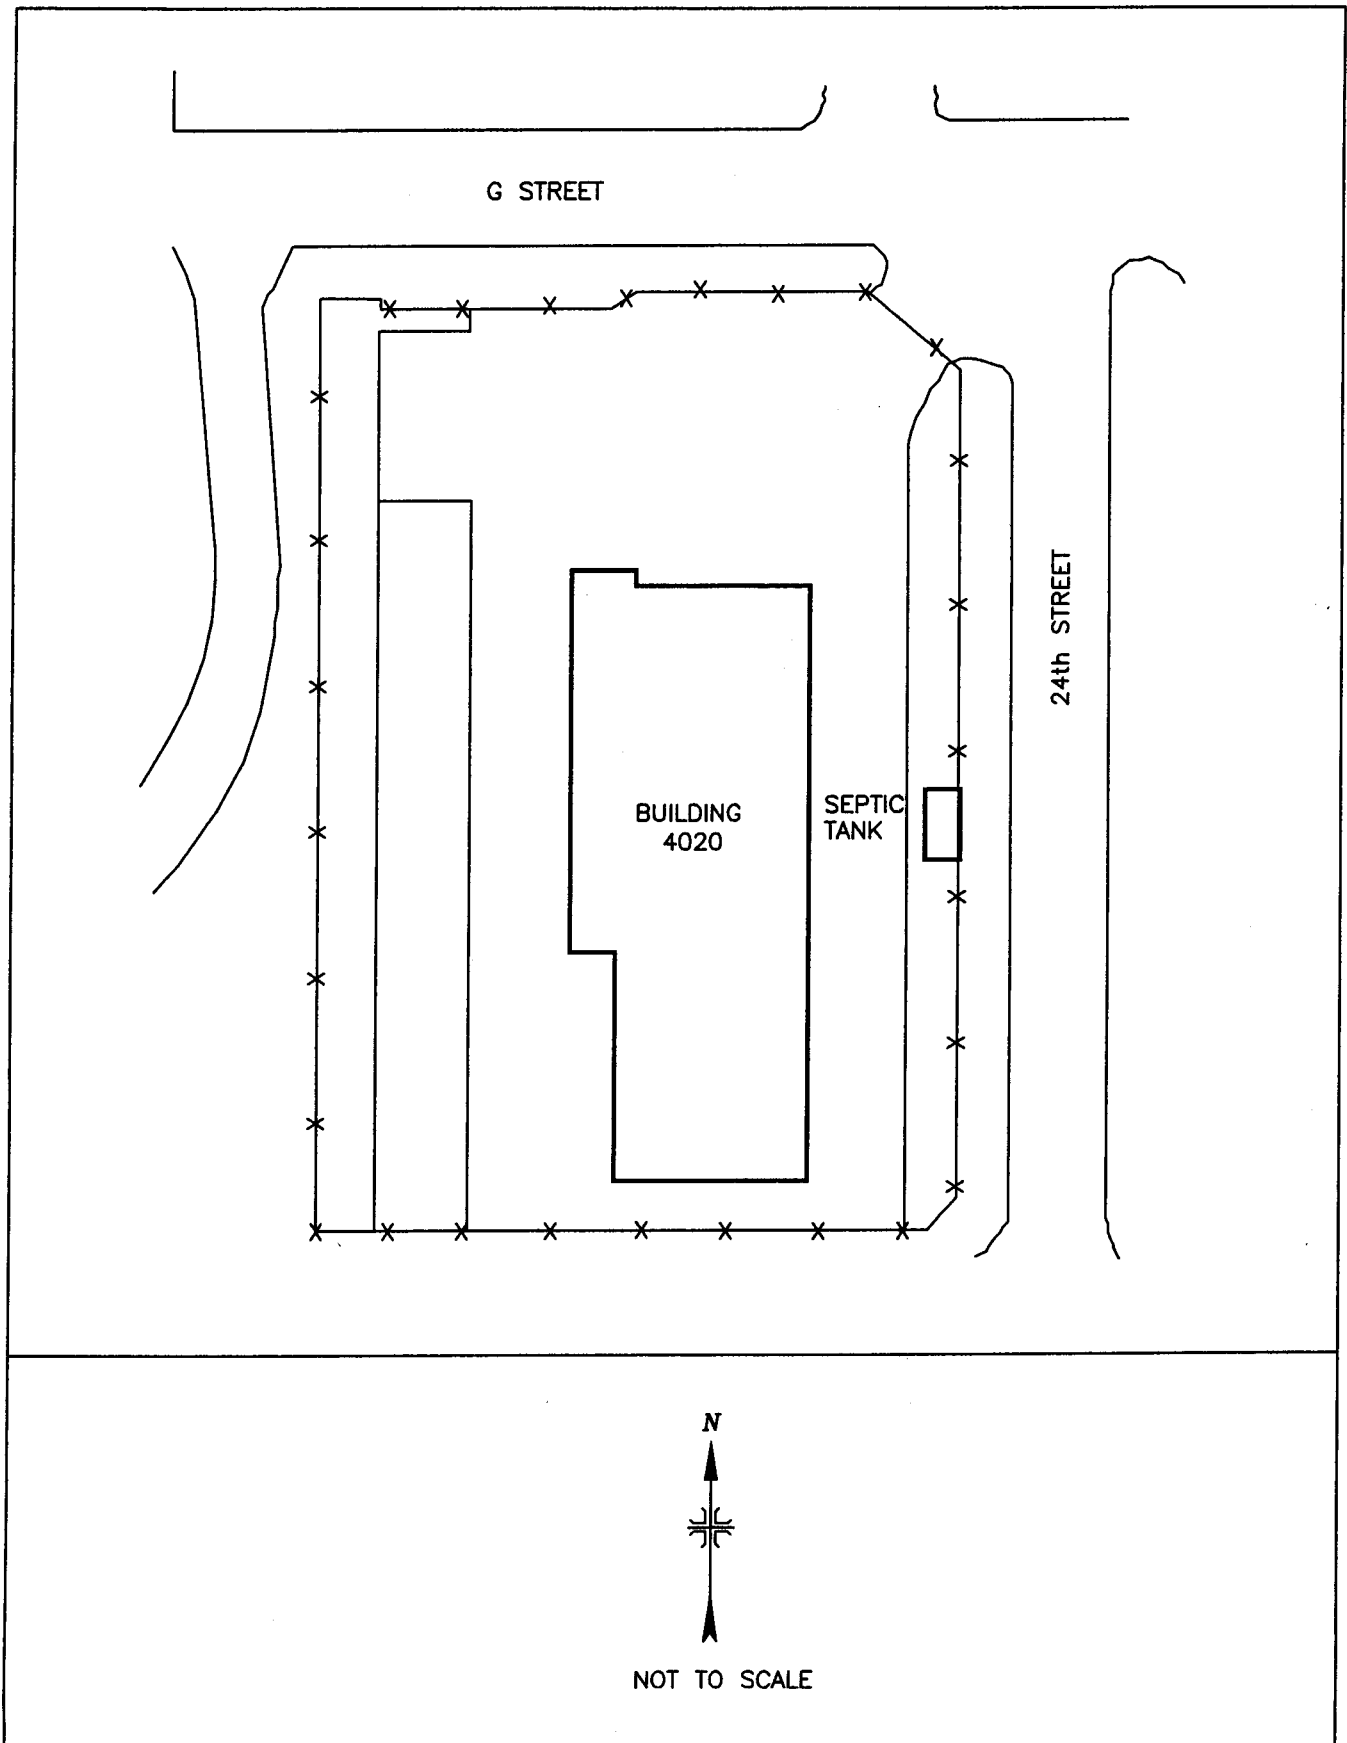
Hot Laboratory (4020) – Plot Plan
